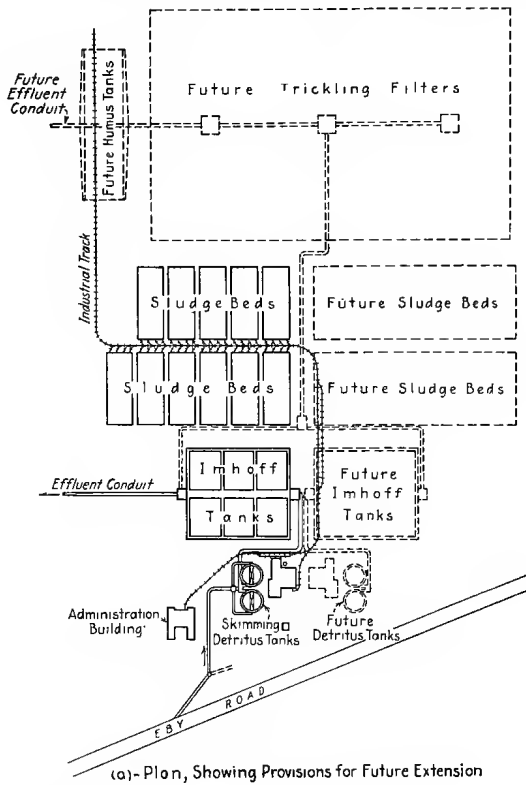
Sedimentation plant at Dayton, Ohio.
